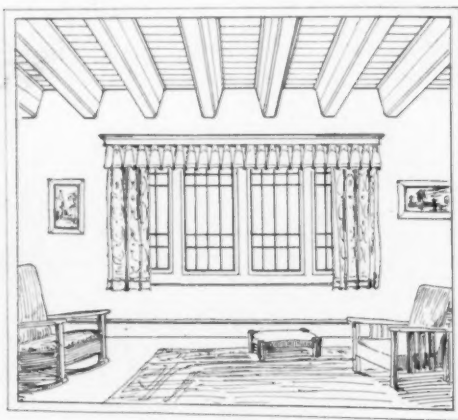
Sketch of Tapering Beam Construction—Residence of Hinsdale Smith, Esq. South Hadley, Mass.
